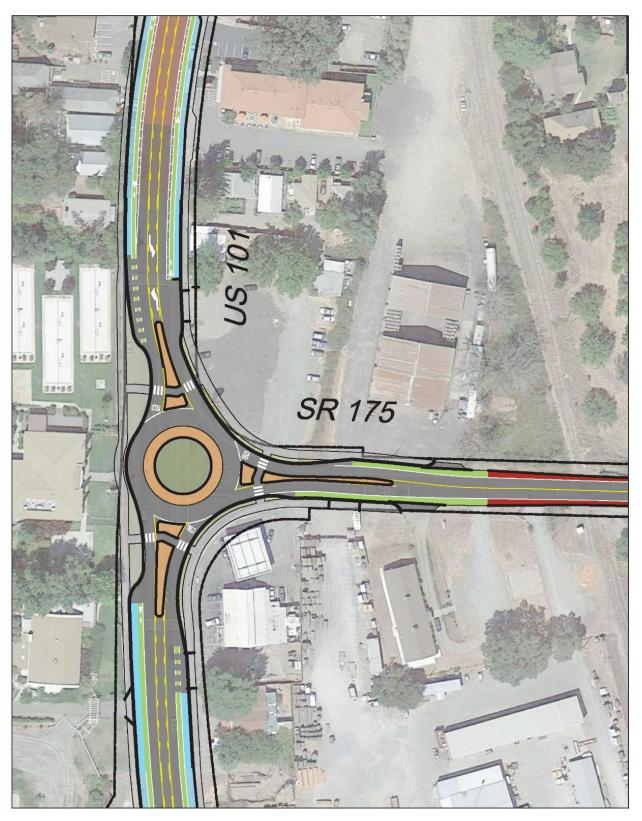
Illustration of proposed roundabout at intersection of Highway 101 and Highway 175 (Source: Hopland Main Street Corridor Engineered Feasibility Study, 2015)
